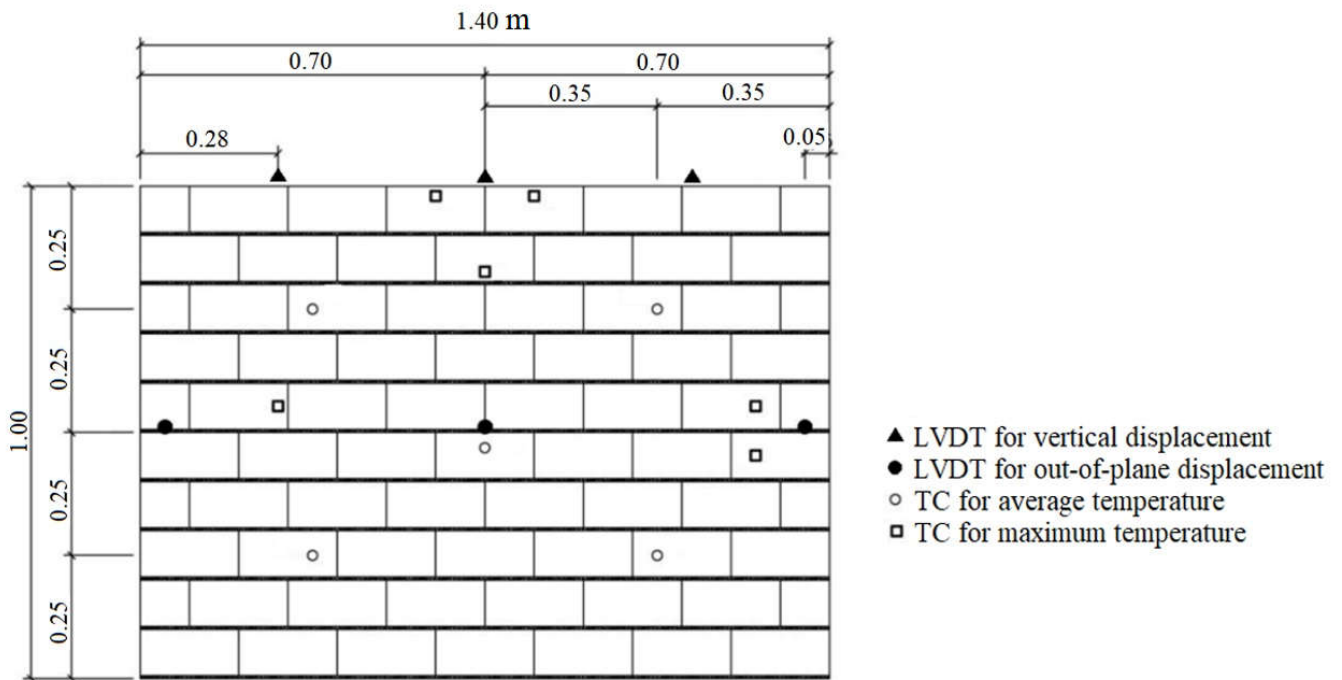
Specimen dimensions and positioning of thermocouples and displacement transducers (dimensions in m) [24]
